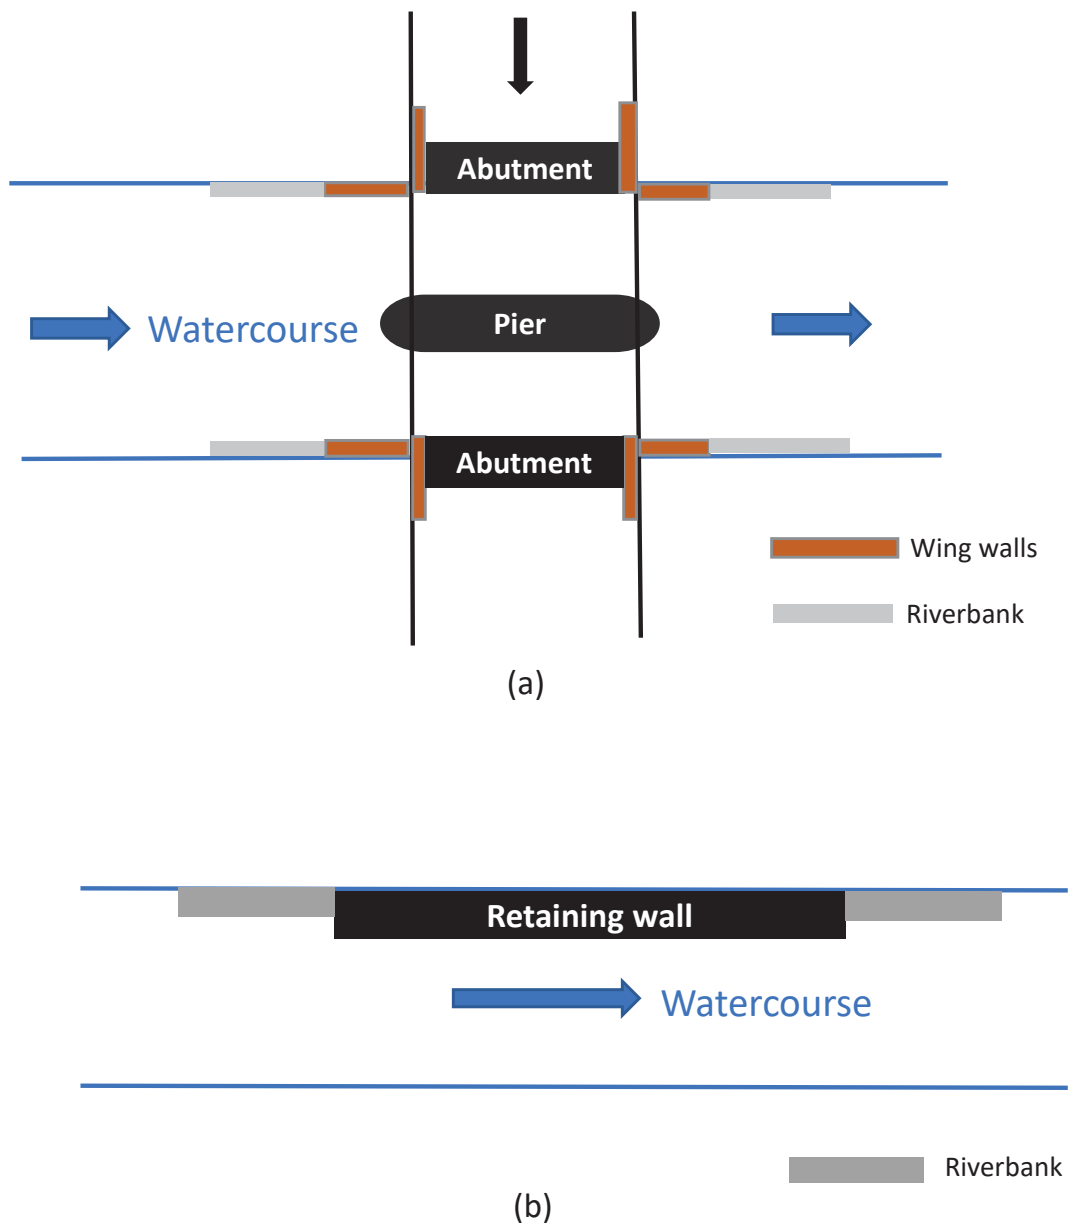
Schematic presentations of a bridge crossing watercourse (a) and a retaining wall adjacent to watercourse (b) (top view)
